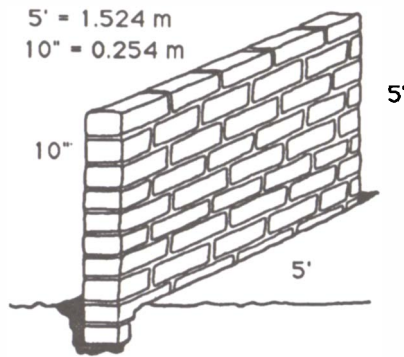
Schematic diagram with depth of test wall foundations and typical test wall dimensions.
